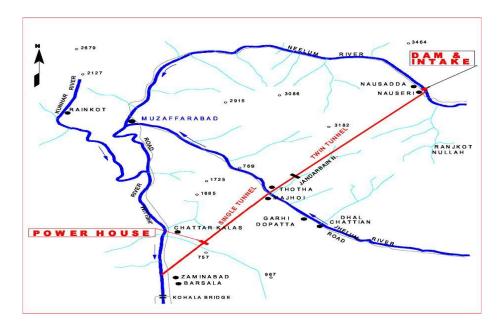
Location plan of the Neelum Jhelum hydropower project.
